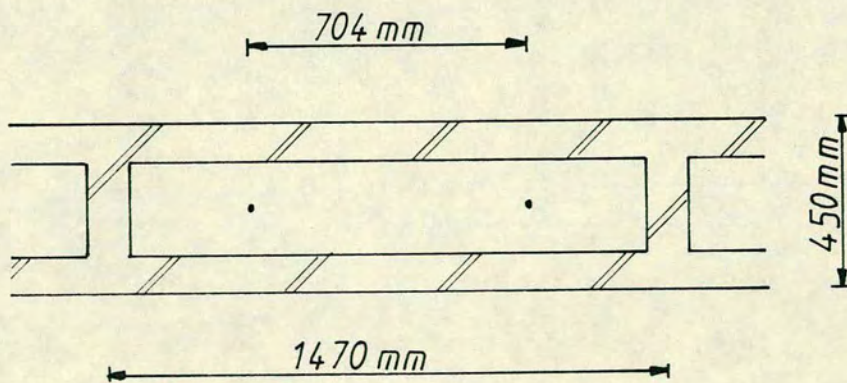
Plan of Diaphragm Wall Tested by Curtin and Phipps⁽²¹⁾
